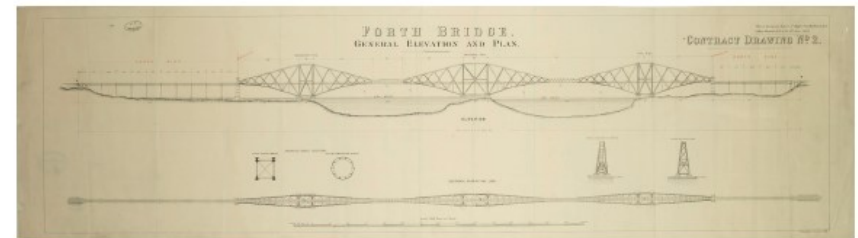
Contract plan and elevation of Forth Bridge, c.1880s
